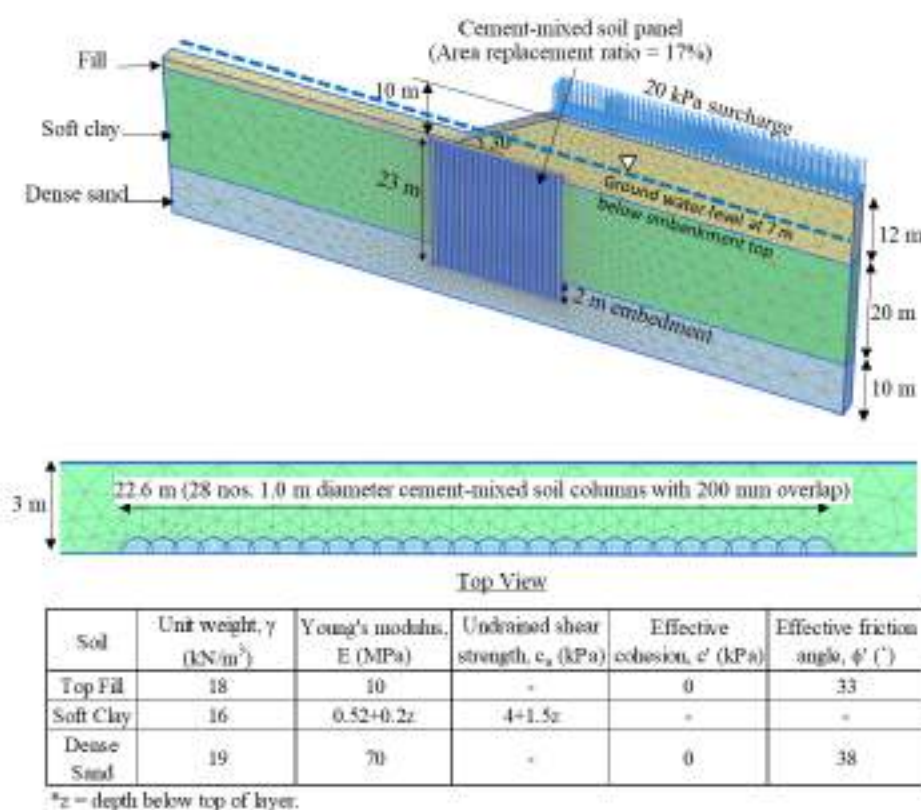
PLAXIS 3D model for cement-mixed soil shear panel under embankment slope
